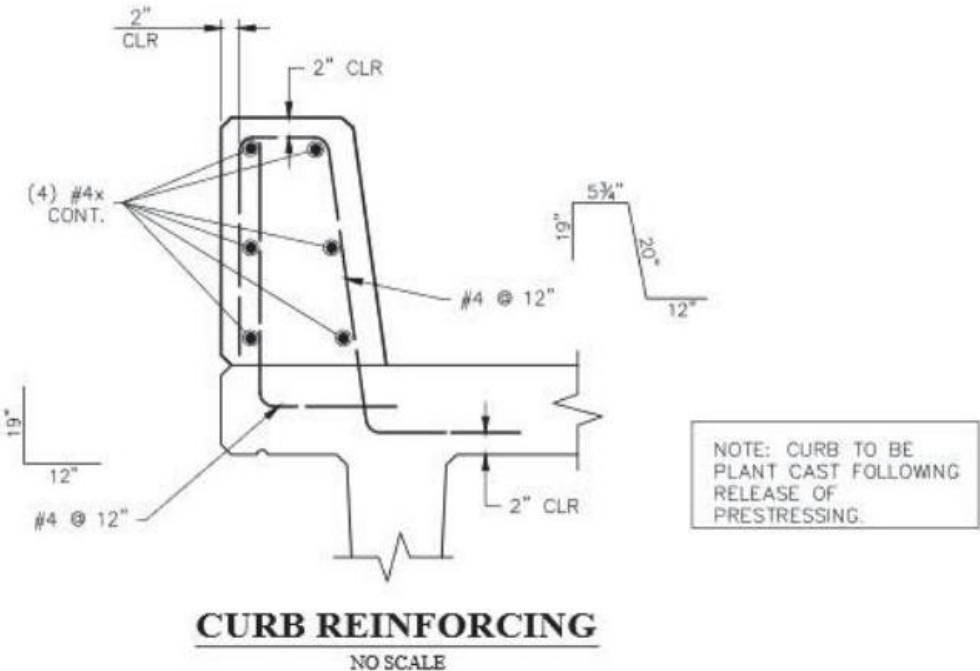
Hellroaring Creek Culvert Replacement Bridge Rail Connection Details [8]
